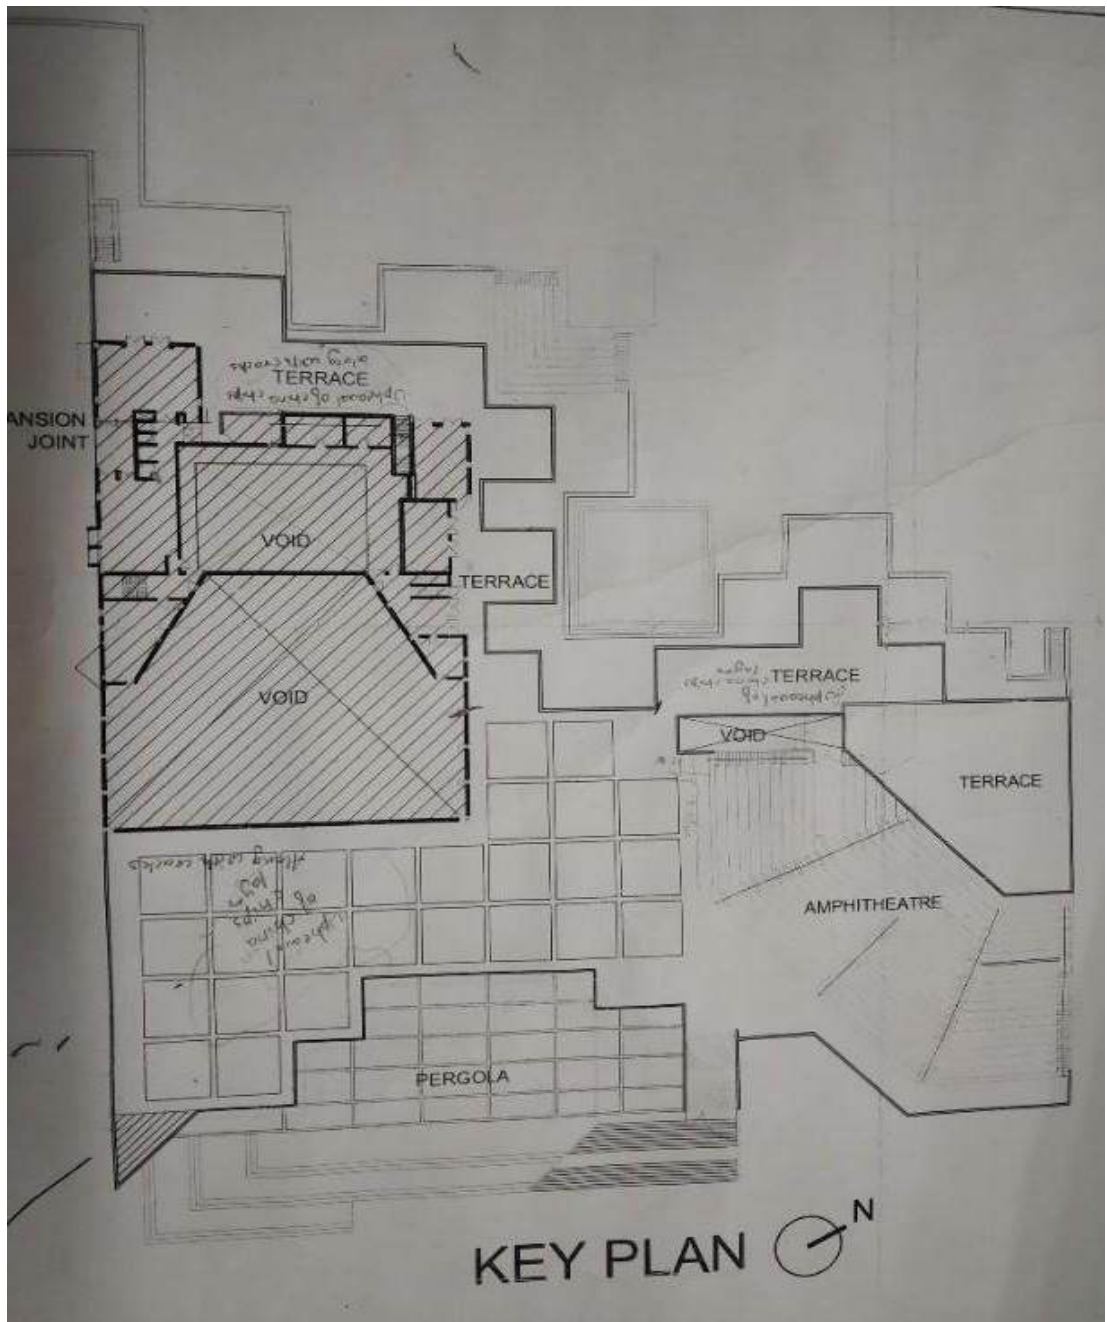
Upheaval of waterproofing layer provided at second floor level
